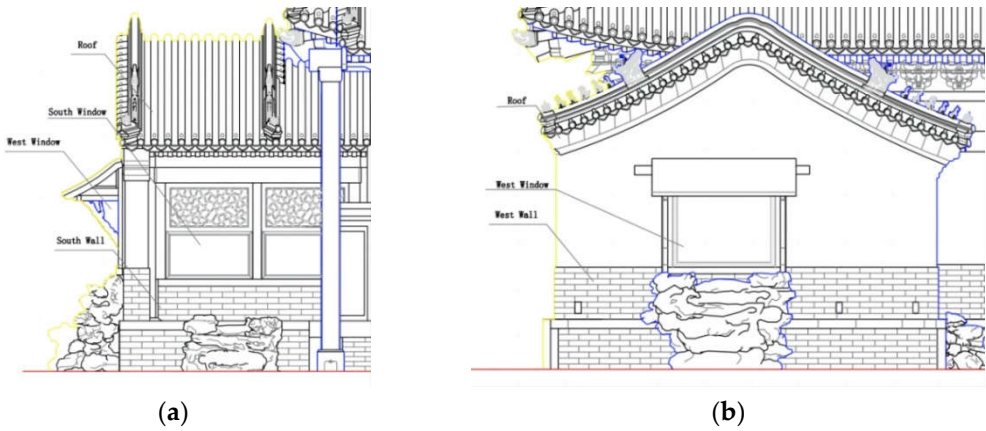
Elevation of a palace-style wooden ancient building in Beijing: (a)South elevation and (b) West elevation.
